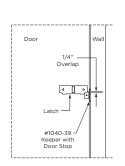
Inswing Door Wall Mount Keeper Installation Detail.
